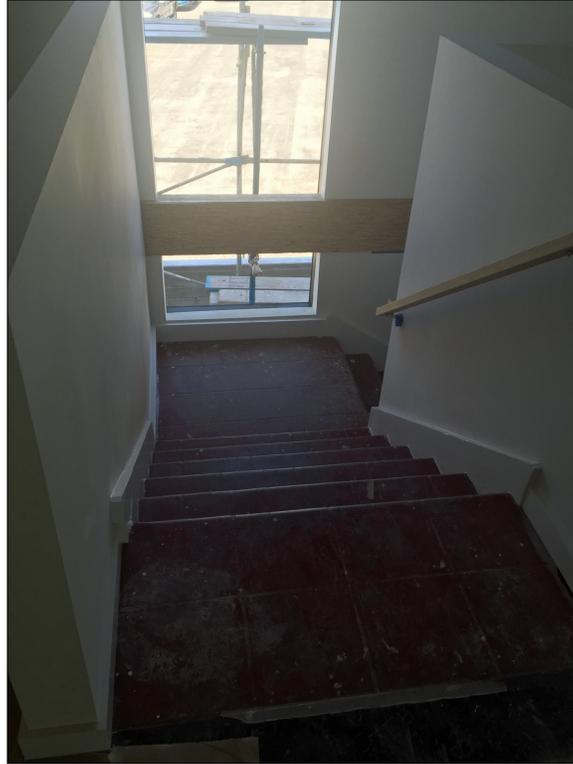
2159 Bay St, interior, north section, second floor, stairs, view west (Snow, 2016)
